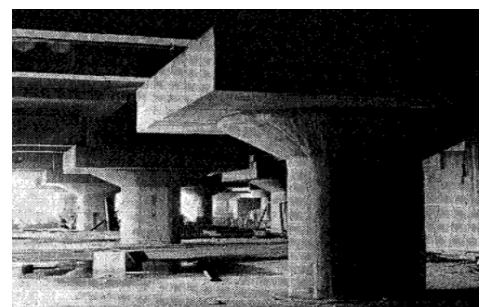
underground construction, source from Kantoorgebouw voor Centraal Beheer te Apeldoorn
